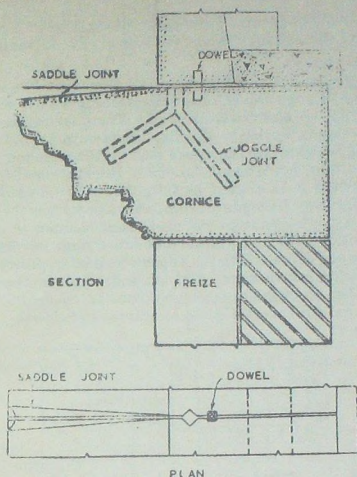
Section through an exterior wall of a building showing different elements of construction in stone masonry.
